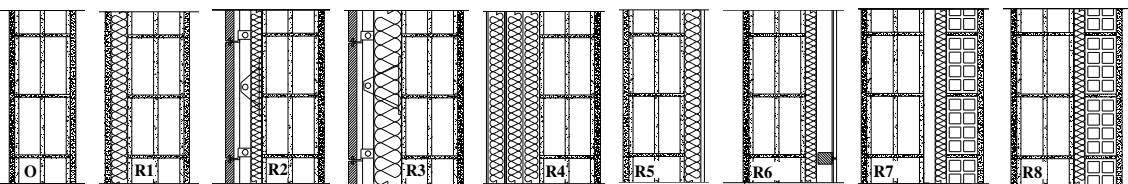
Vertical cross-section of the existing and rehabilitation construction solutions of the façade walls
